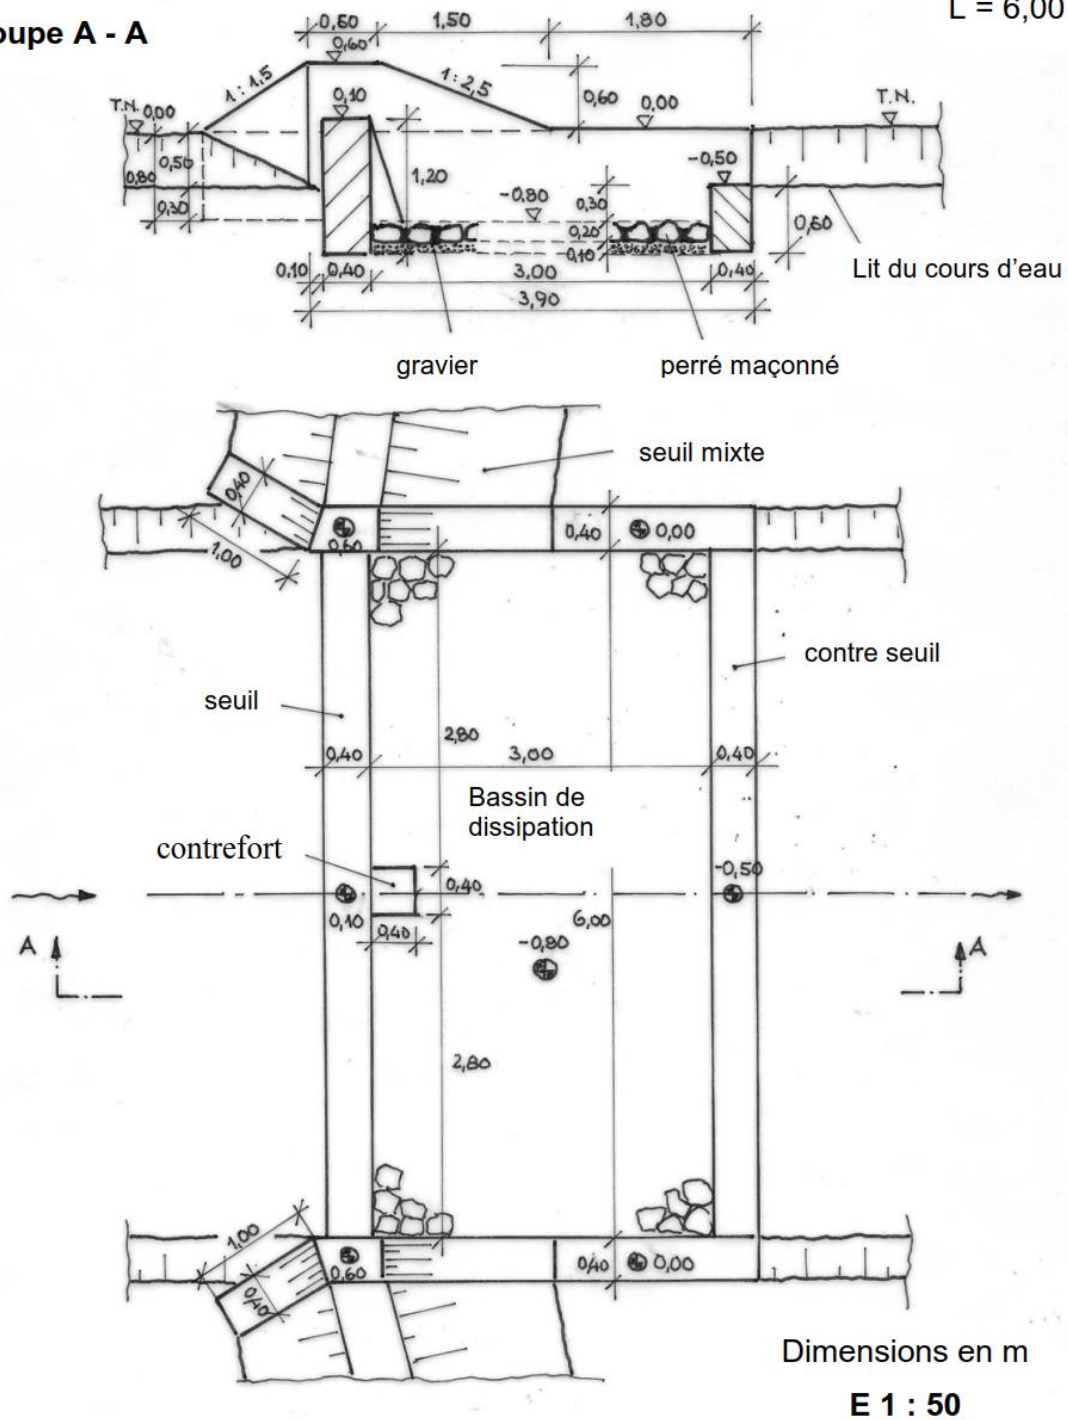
Drainage structure for single sill (detail and section A-A)
